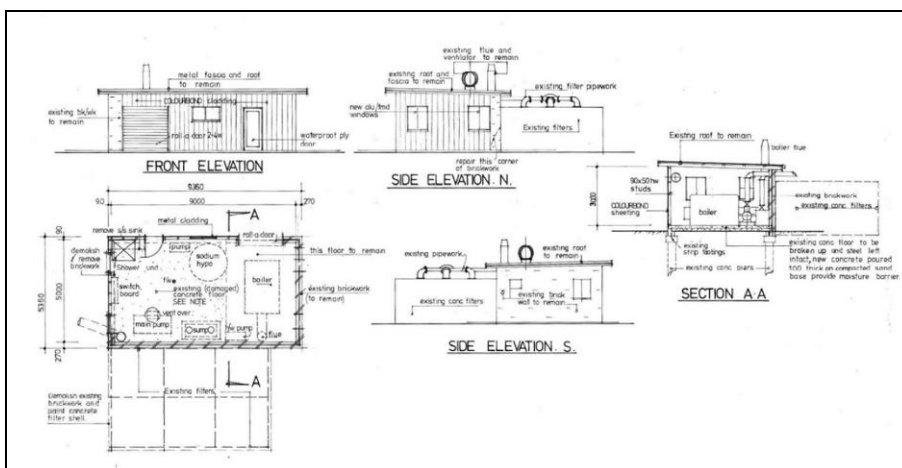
Details relating to the upgrade of the plant room c. 1972.
